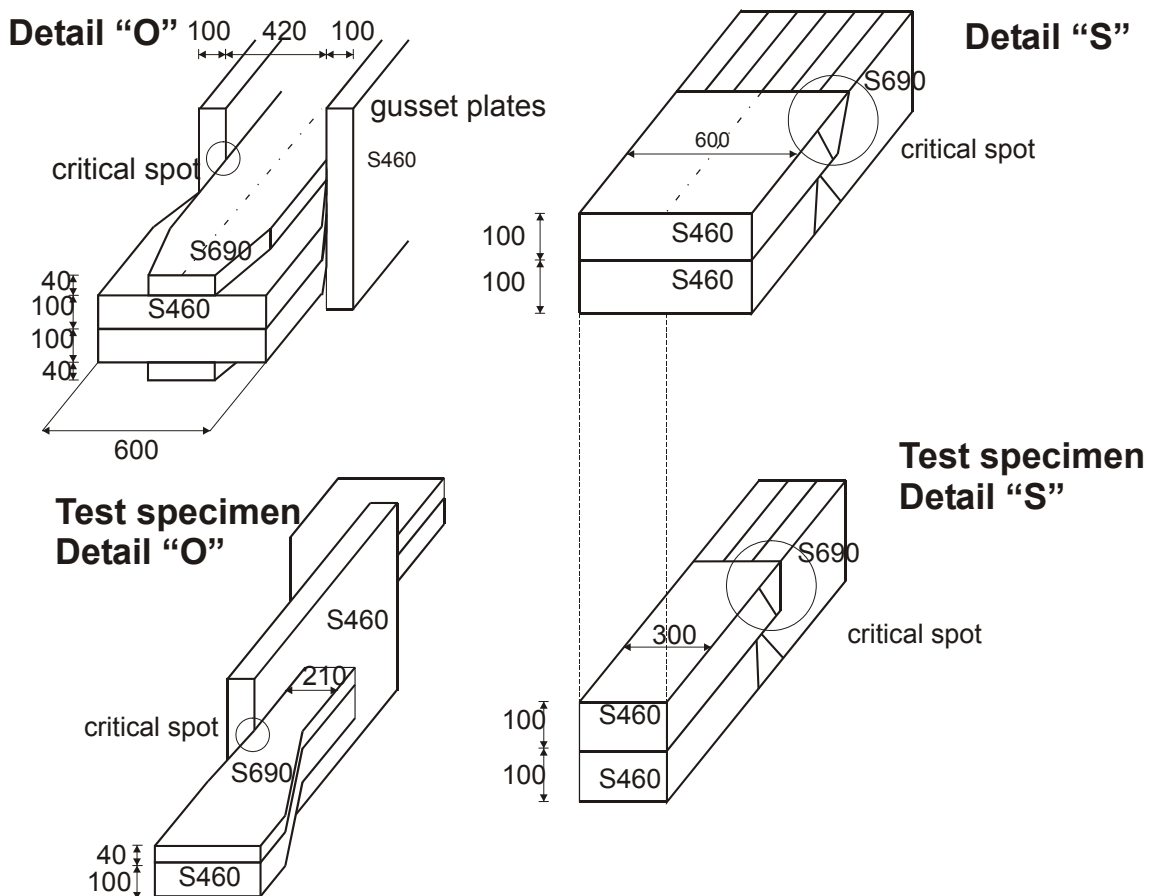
Examples for structural details as built (above) and design of test specimens (below)
